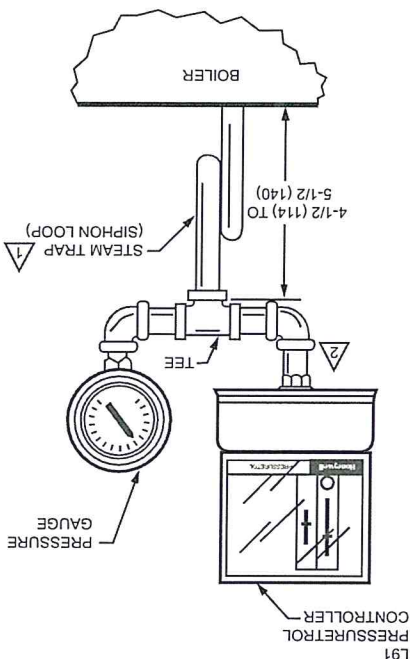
Approximate dimensions in in. (mm) for mounting L91 Pressuretrol® Controller beside Pressure Gauge on Steam Trap (Siphon Loop).
